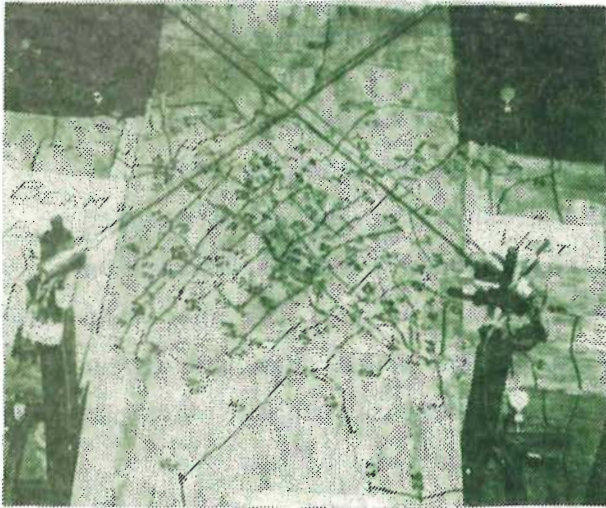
Joint cracking pattern for specimen with high joint reinforcement ratio (Meinheit and Jirsa, U.S.A.)
